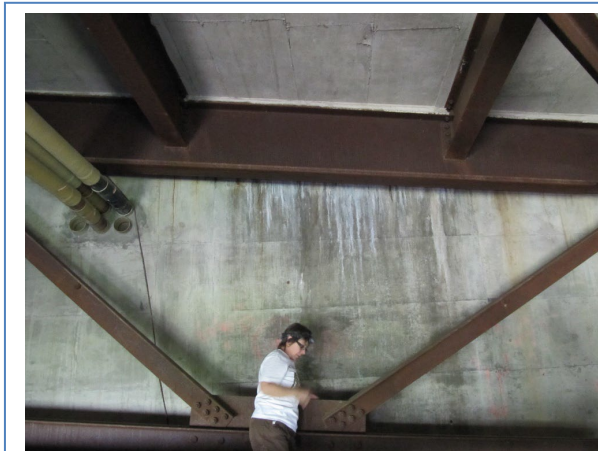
Staining from urine from bats roosting on the underside of a concrete bridge. Photo courtesy of M. Sarell.
